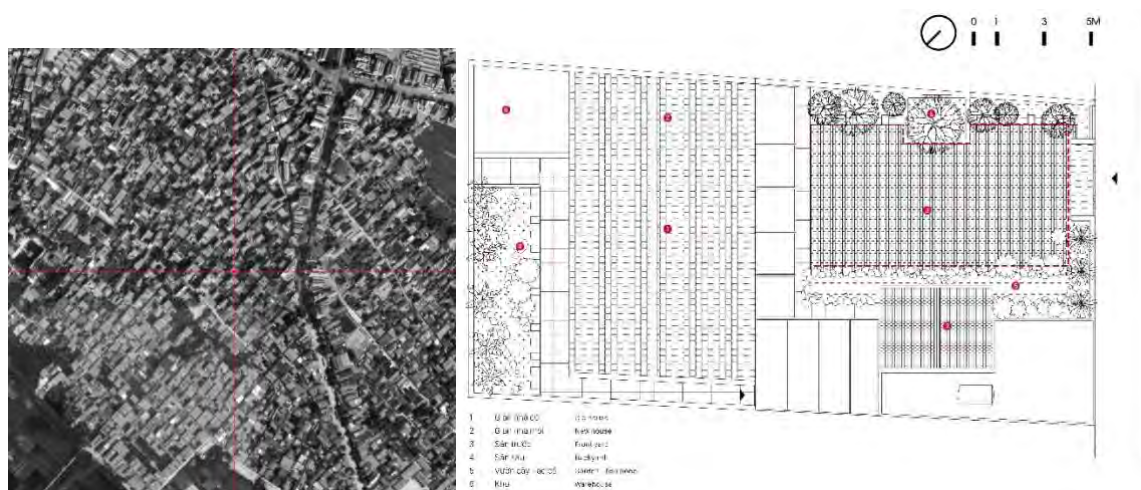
Doan Vien House is a project combining new construction and renovation, in areas with high construction density (Atelier dubosc et Associes, 2022)
